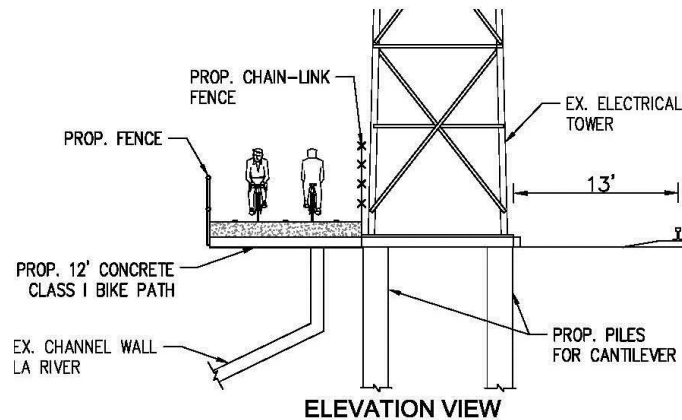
Top of bank detail at obstructions, cantilevered path.
